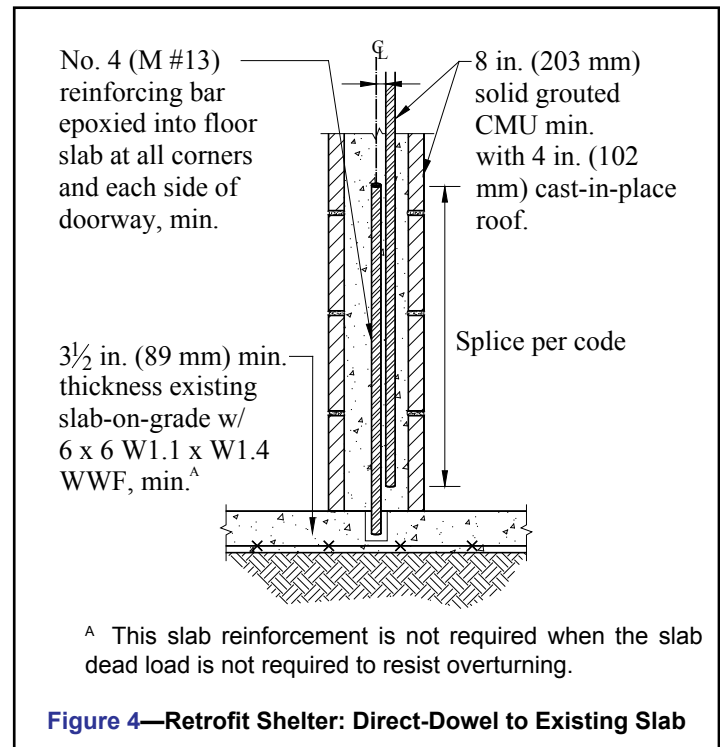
Retrofit Shelter: Direct-Dowel to Existing Slab
